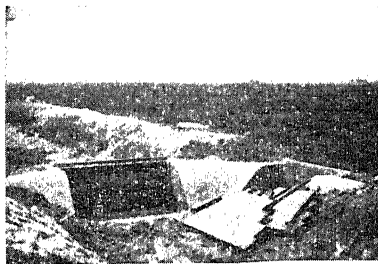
Combined concrete check gate and levee gate, showing forms used for cross walls.
